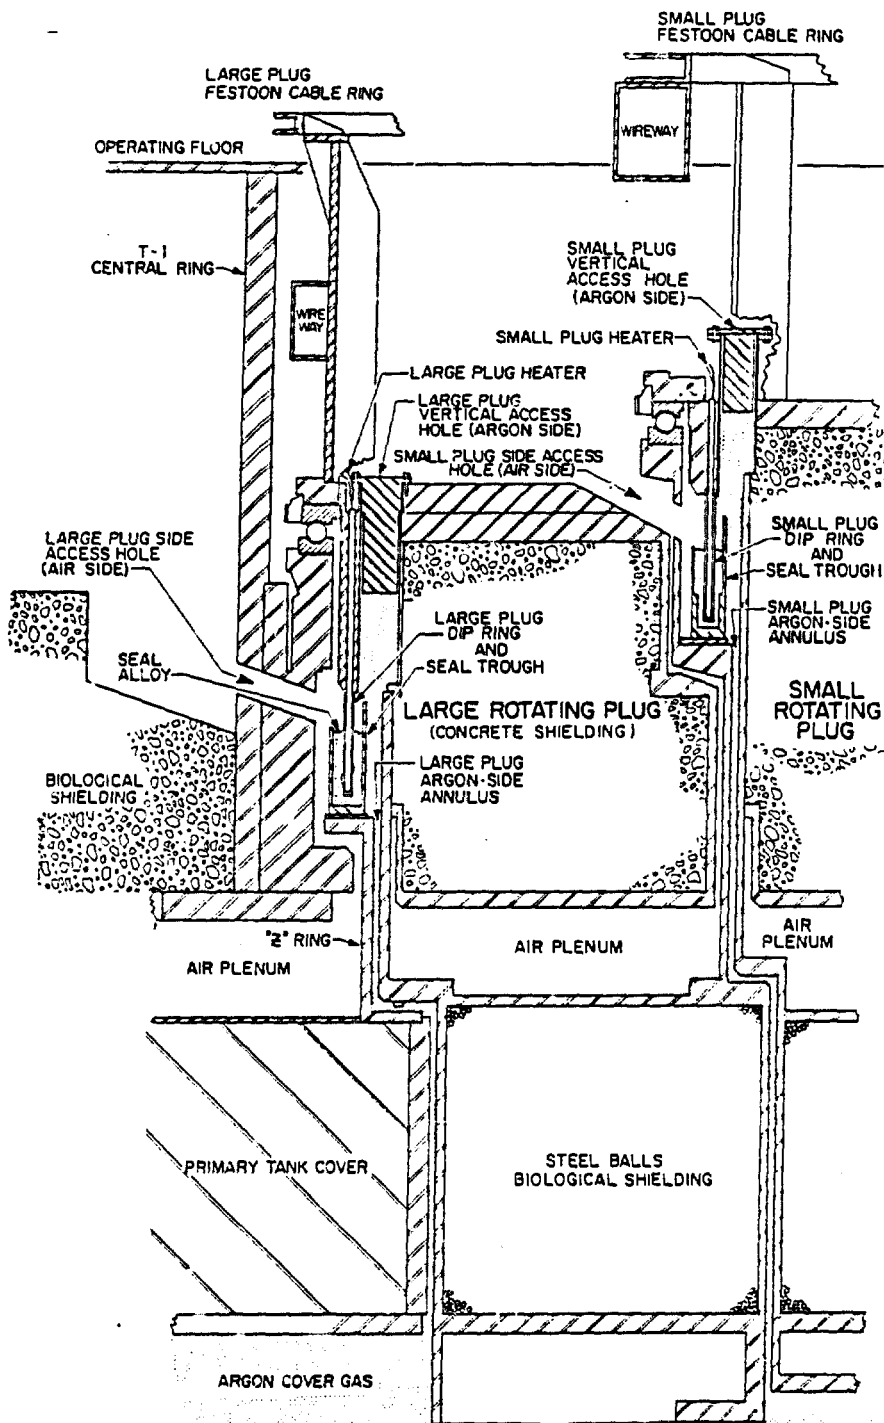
ROTATING PLUG SEALS AND ACCESS HOLES
